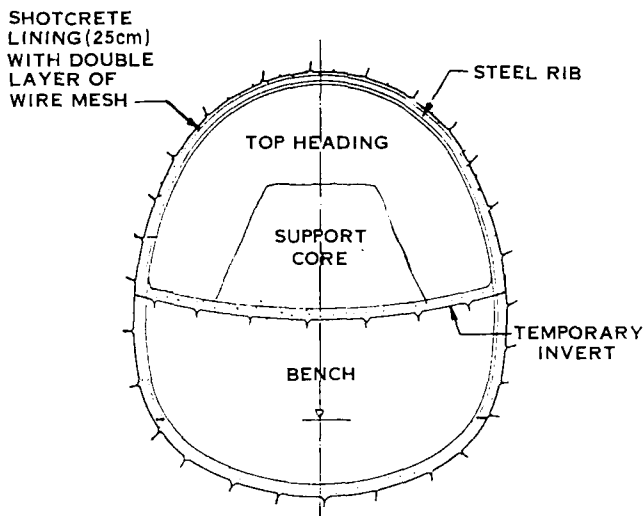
SINGLE-TRACK TUNNEL SHAPE AND GROUND TYPE IV SUPPORT ELEMENTS.
